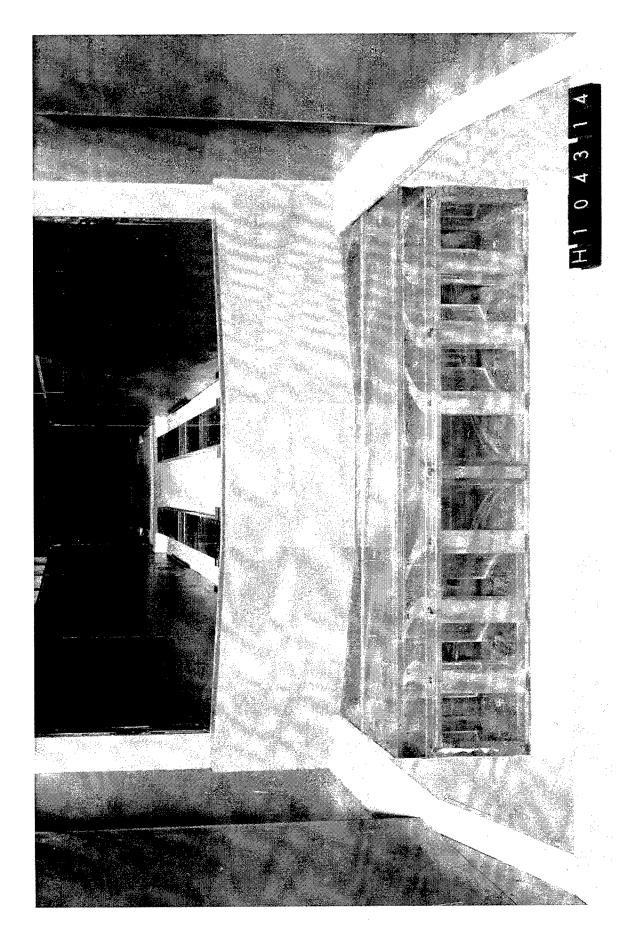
Dry bed view of Type 1 (original) design intake looking downstream
